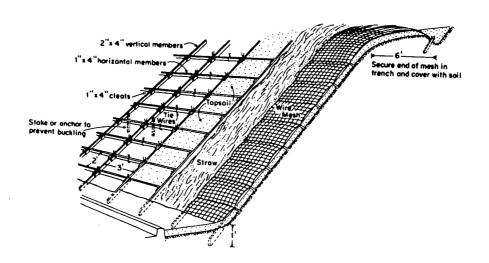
Cut slope stabilization using an anchored timber grid to hold topsoil and slope plantings in place. Structural grid provides temporary slope protection and permits establishment of vegetation. Once established the plants provide long term slope protection and erosion control.
